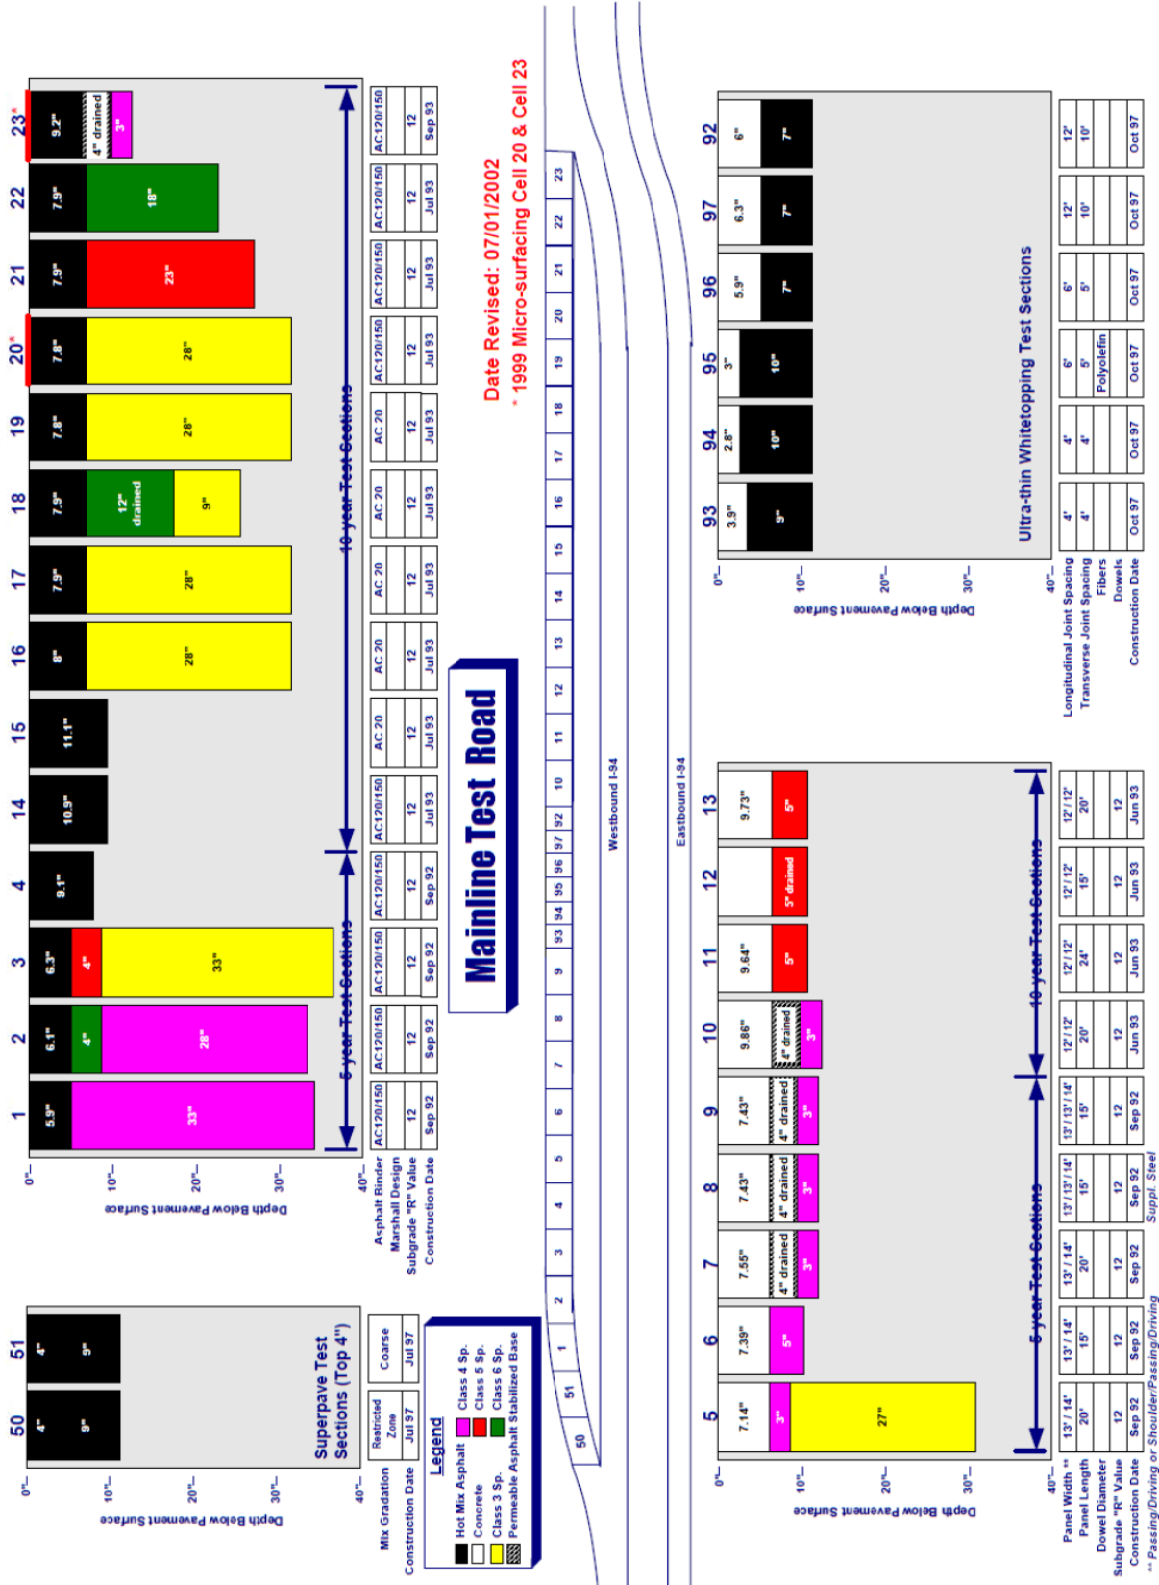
MnRoad Test Road (Mulvaney and Worel 2002).
